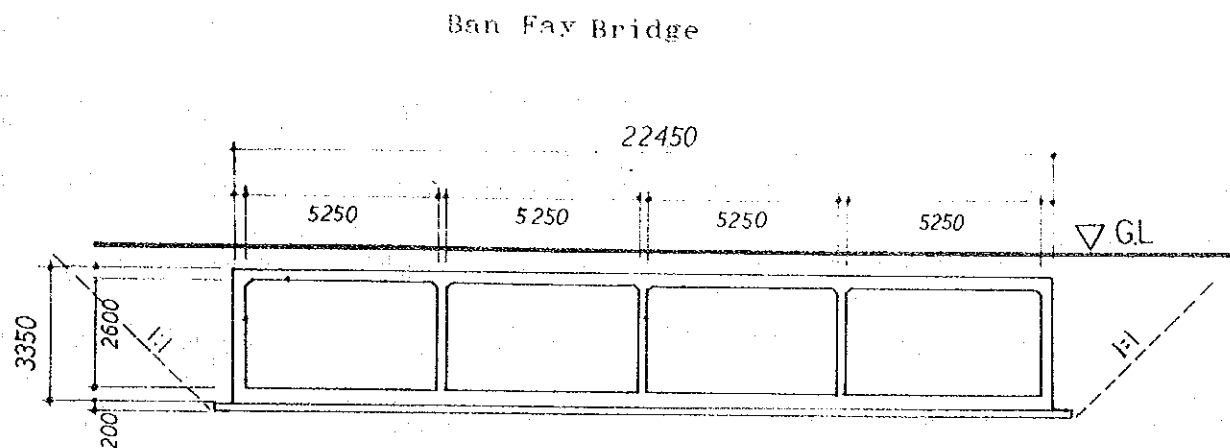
(2) Facility Alternatives for Bridge and Culvert
